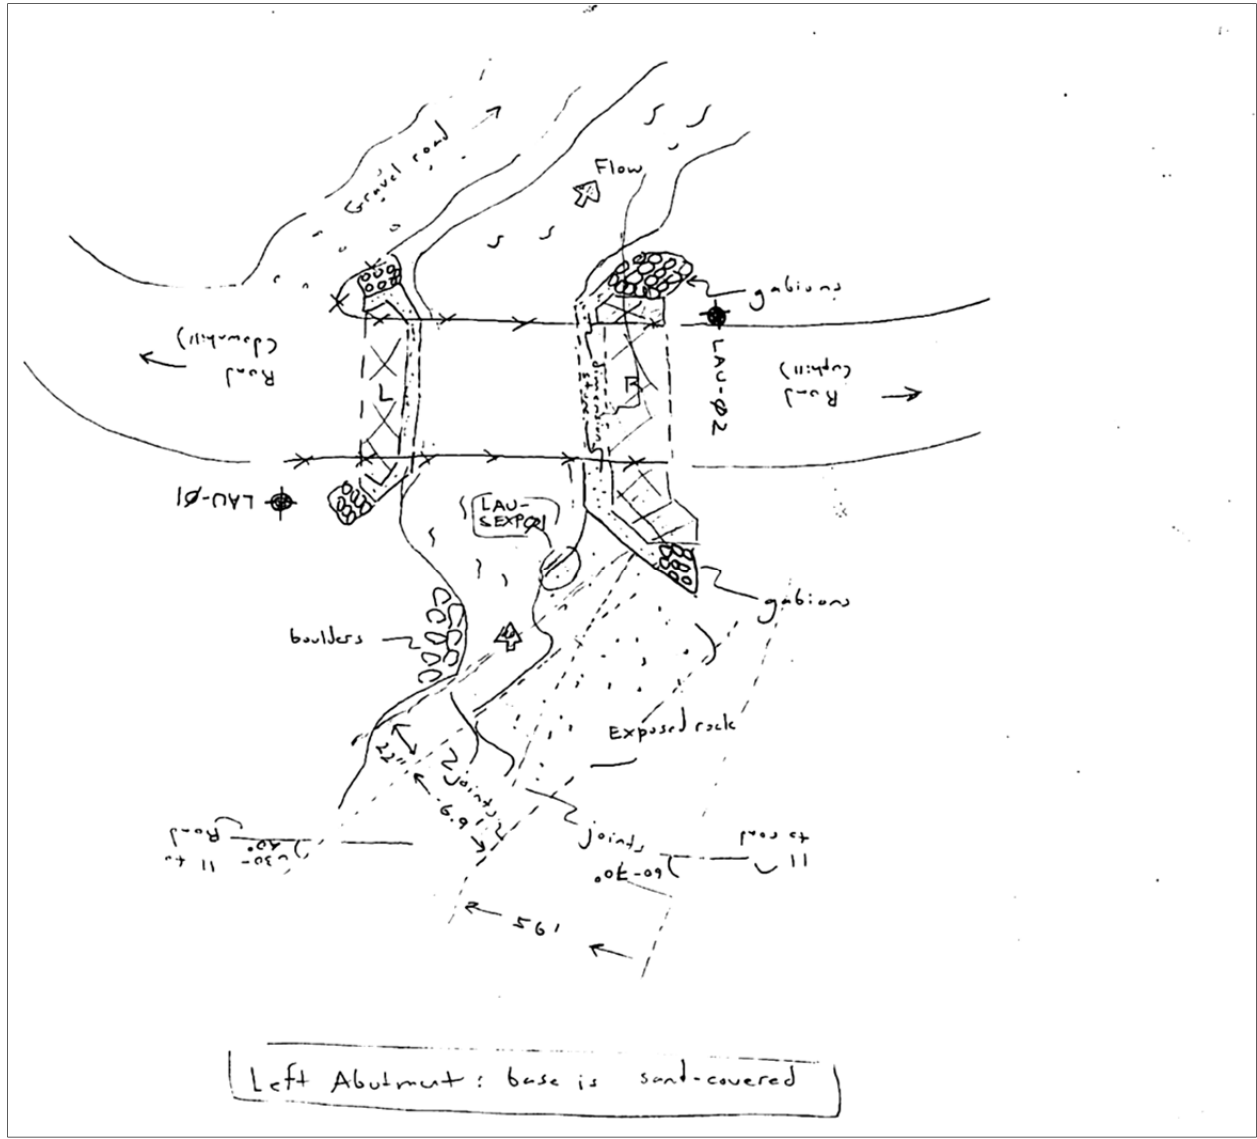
Field sketch of Laurel Fork Bridge, looking downstream.
